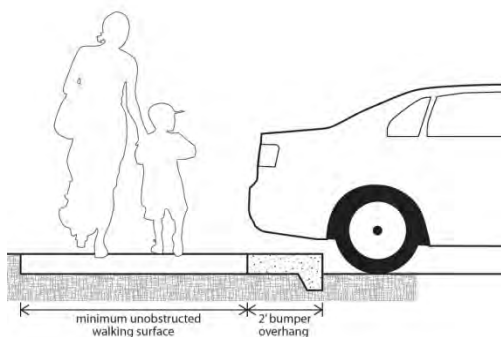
B.3: Concrete extension to accommodate bumper overhang.
